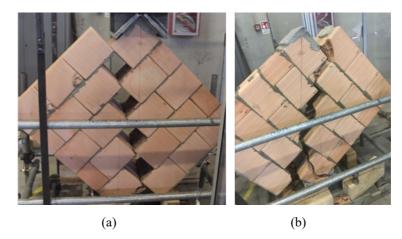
Diagonal compression tests on masonry walls: (a) typical rupture pattern; (b) rupture along clay blocks.
